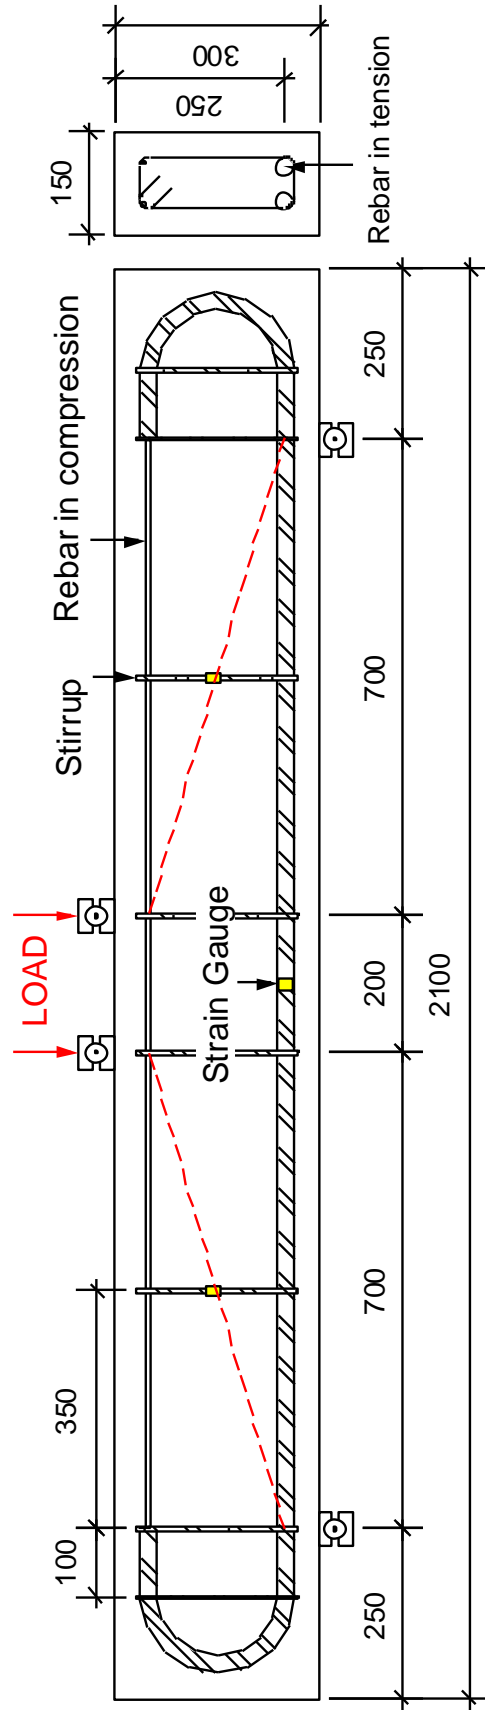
Dimensions and reinforcement details of RE-12.
